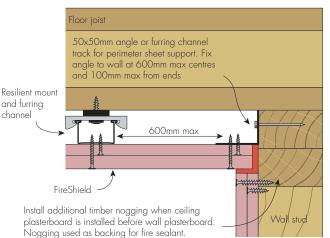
Fire Rated Ceiling to Wall – Alternate Detail Resilient mount and furring channel
